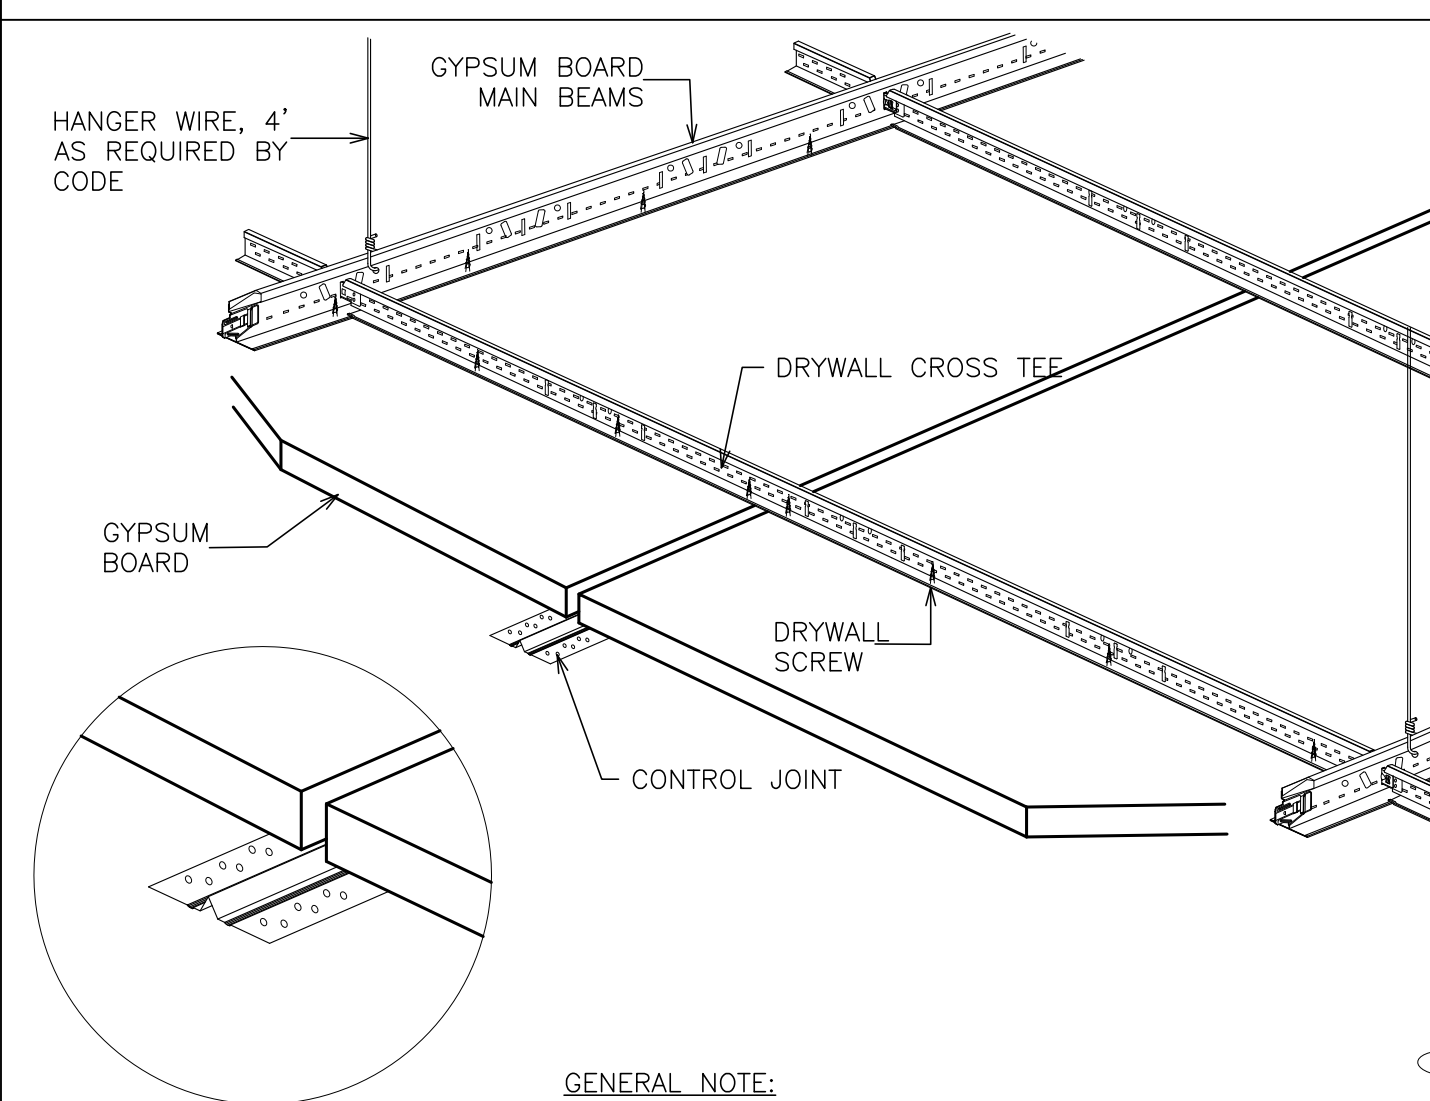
DETAIL - THRU DRYWALL SOFFIT @ ACOUSTICAL CEILING SYSTEM
